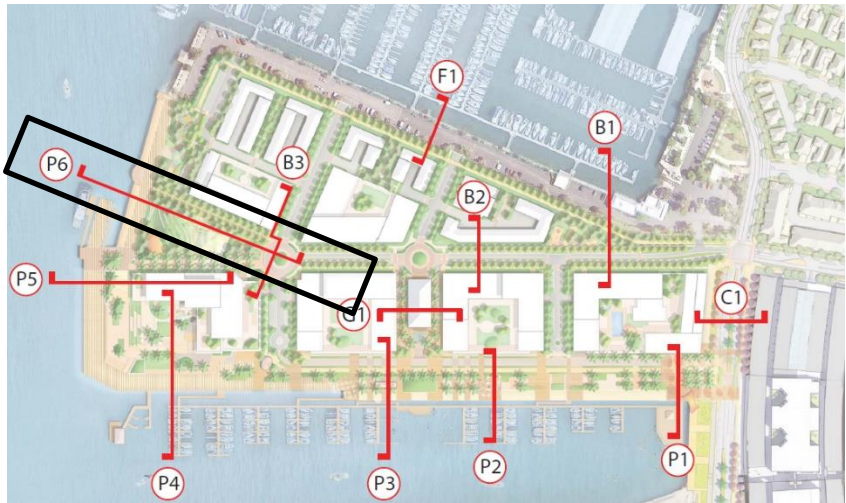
ILLUSTRATIVE CROSS-SECTION B3: CENTRAL BOULEVARD AT WATERFRONT PARK ENTRANCE (VIEW LOOKING NORTH FROM NORTH PORTION OF SITE)
